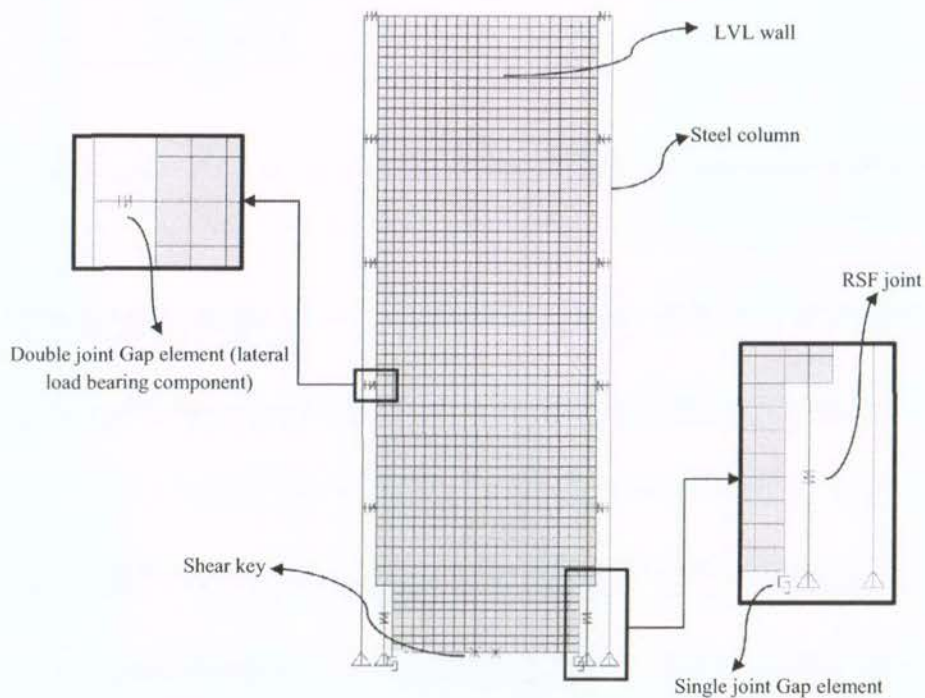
General arrangement of the numerical model developed for the timber rocking wall with RSF joints.
